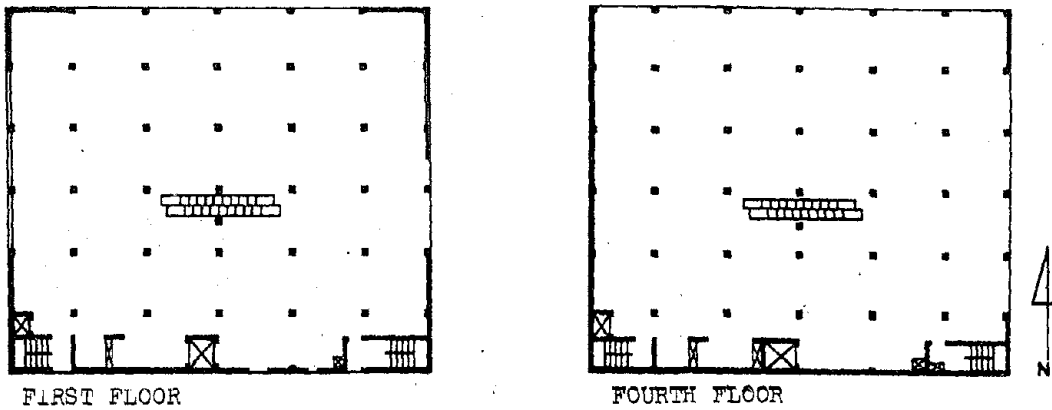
Plans of J.C. Penney Store, Anchorage, Alaska
